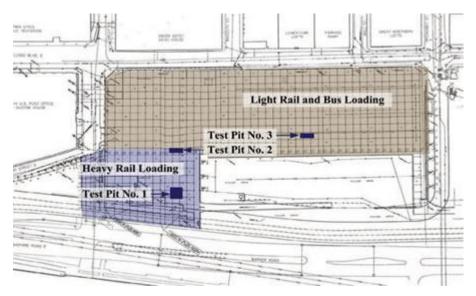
Figure B. Plan view of the track deck showing anticipated design loads and foundation test pit locations
